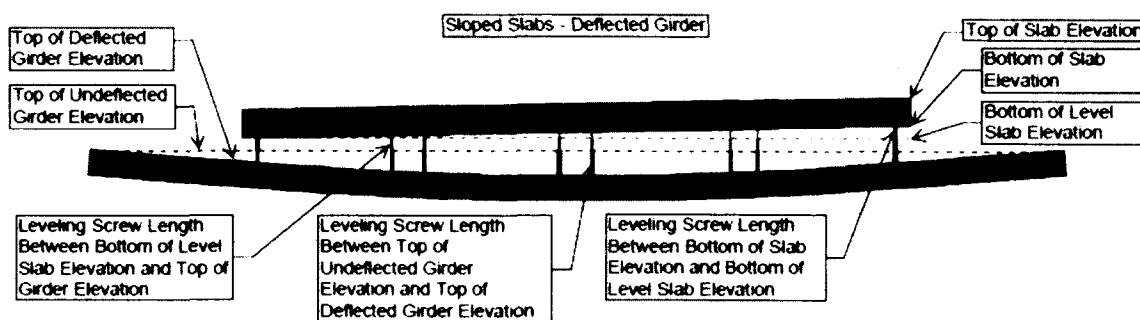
Sloped Bridge Deck Deflected Girder Leveling Screw Length
